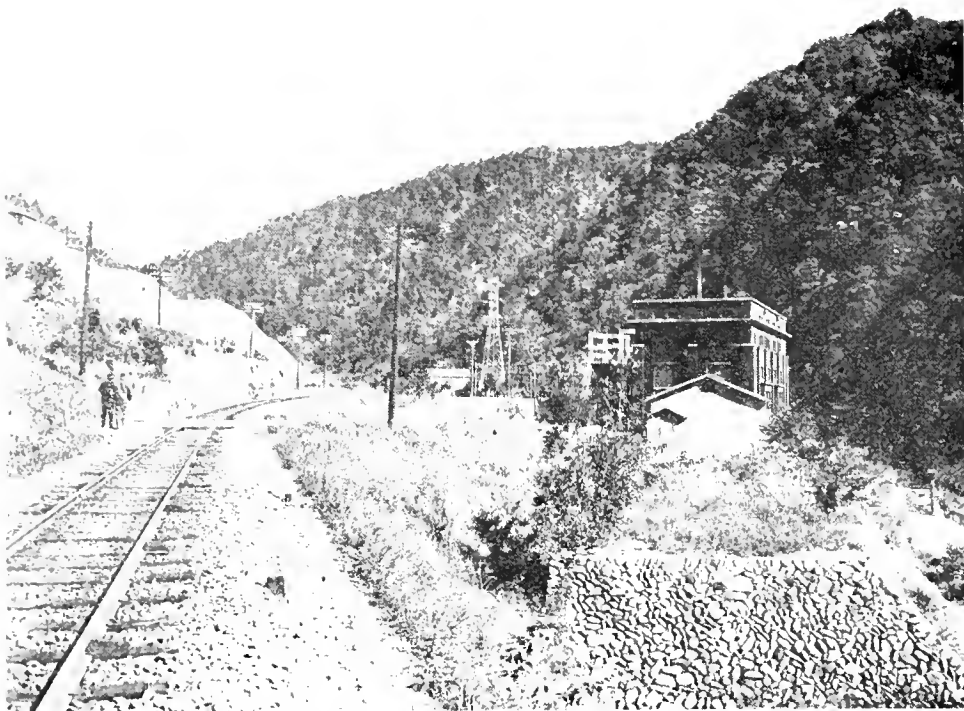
Shimohara Plant—General view. Buried penstocks are under stone masonry and railroad. Headgates are on extreme left top; tail race on extreme right bottom into Hida River
